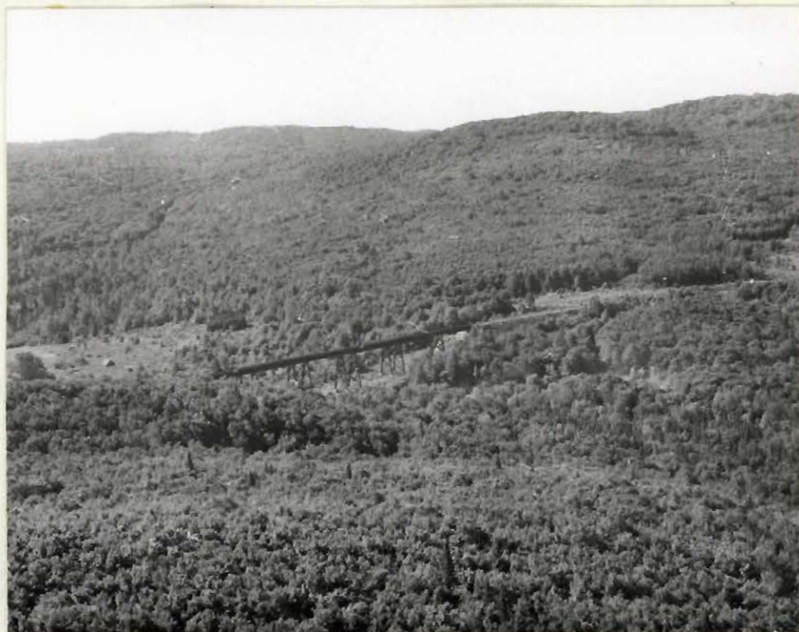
View looking south from Bellevue Ridge towards Algoma Central Railway.
